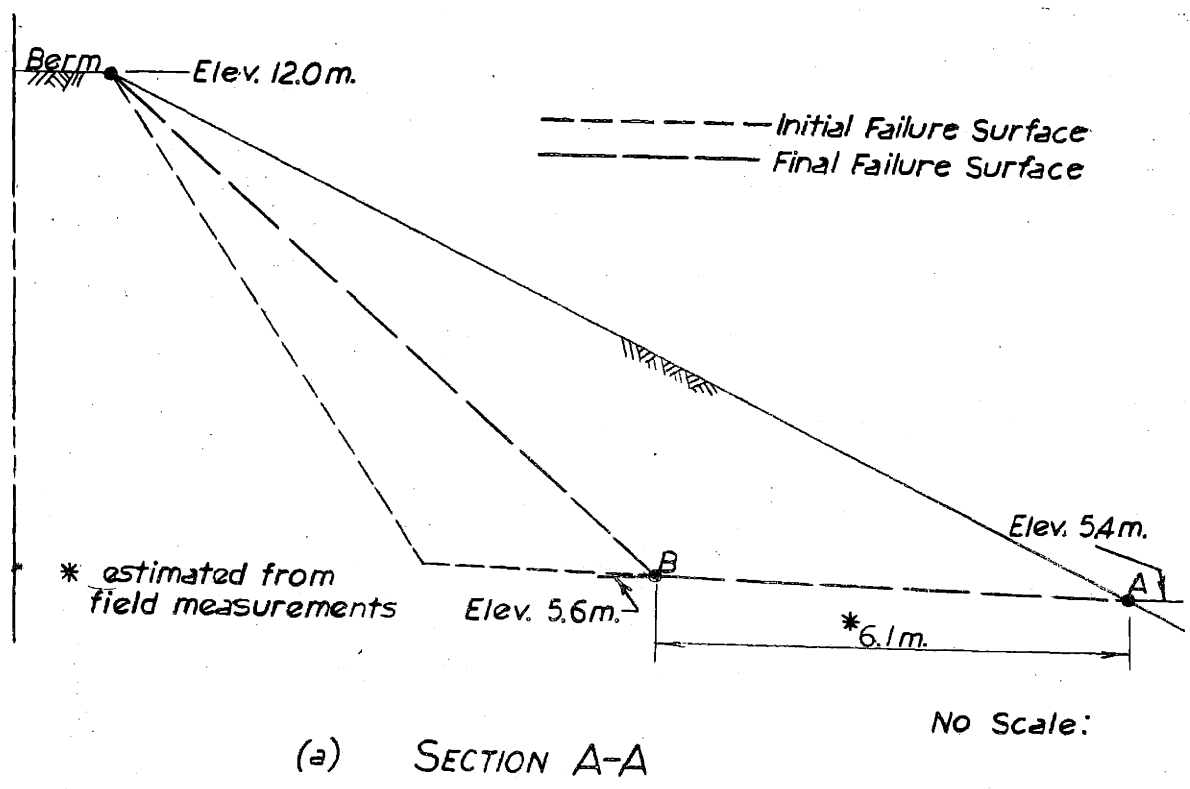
DETAIL OF NORTH WALL SLIDE ZONE
